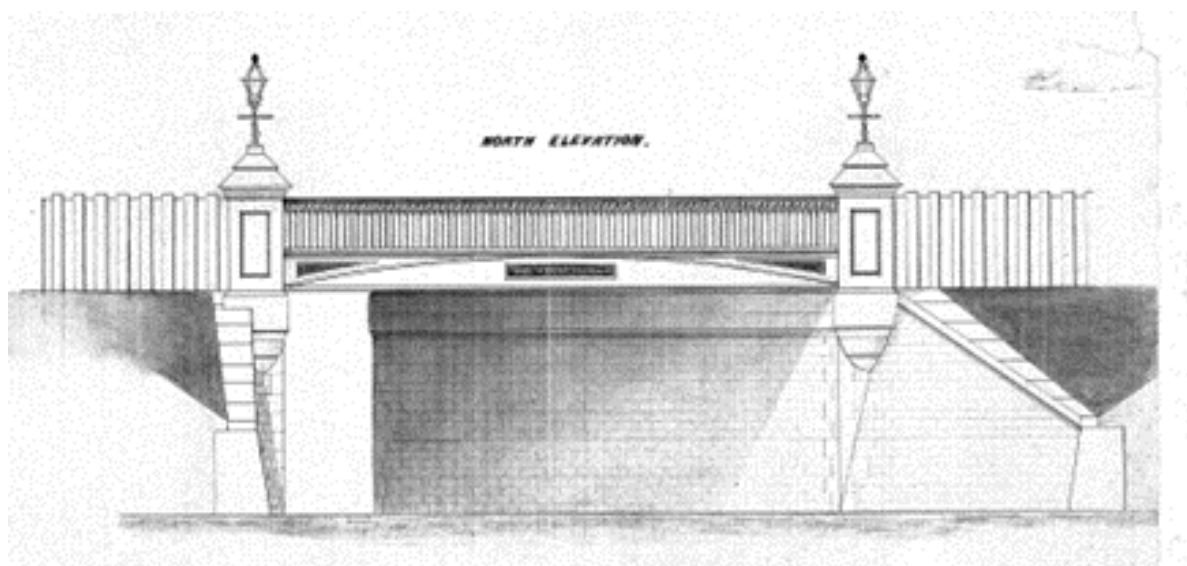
Undated plan from Network Rail of the north elevation (Network Rail 998371 LNE)¹¹¹
